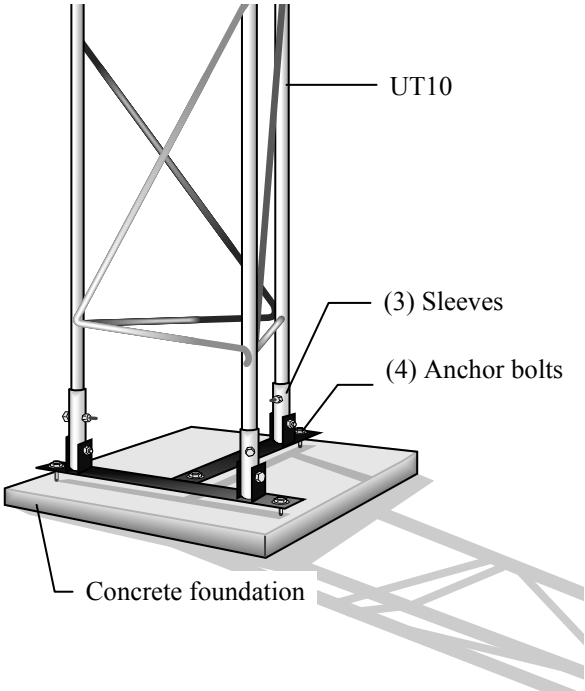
UT10 Tower and Concrete Foundation
